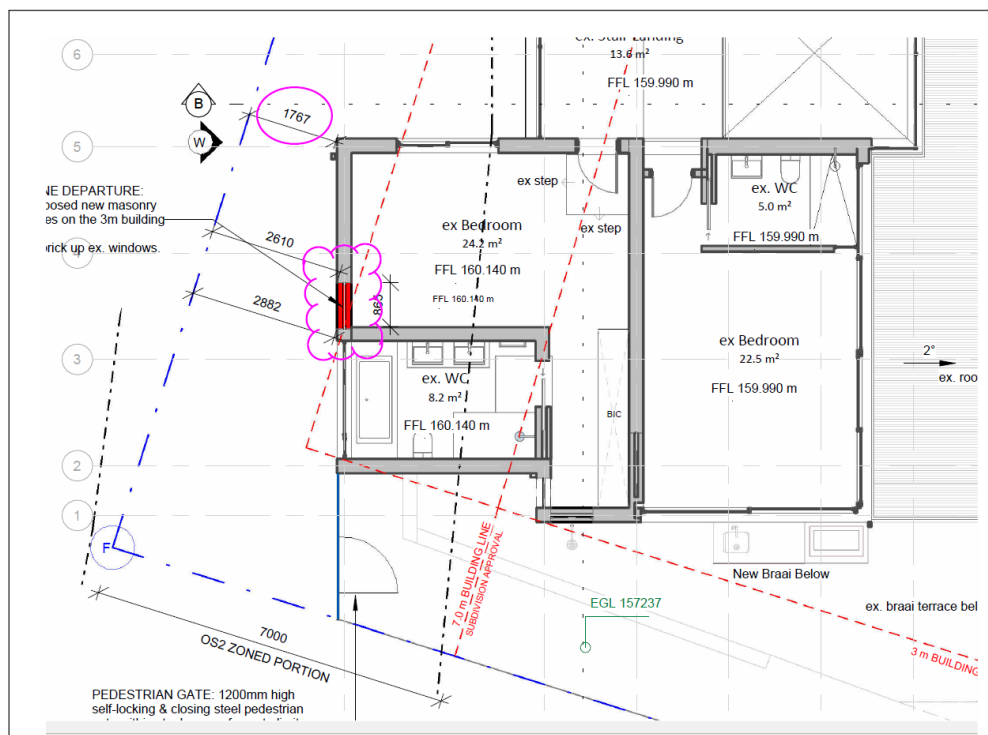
Portion of bricked up wall straddling the 3m western common building line
